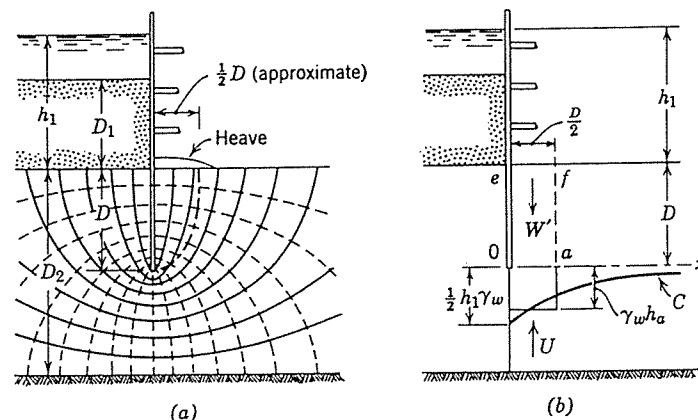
Use of flow net to determine factor of safety of row of sheet piles in sand with respect to piping. (After Terzaghi and Peck 1948.) (Fig. 104, p. 231, *Soil Mechanics in Engineering Practice*, K. Terzaghi, and R. B. Peck, John Wiley and Sons, New York, 1948.)
